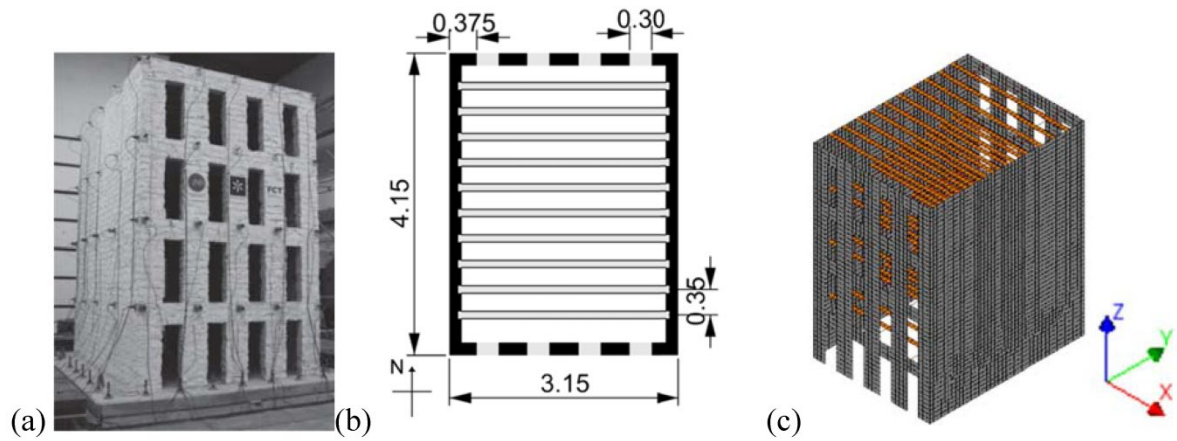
Four storey building: (a) the tested prototype (b) plan (unit: m) and (c) FE model (a from Mendes et al. 2014).
